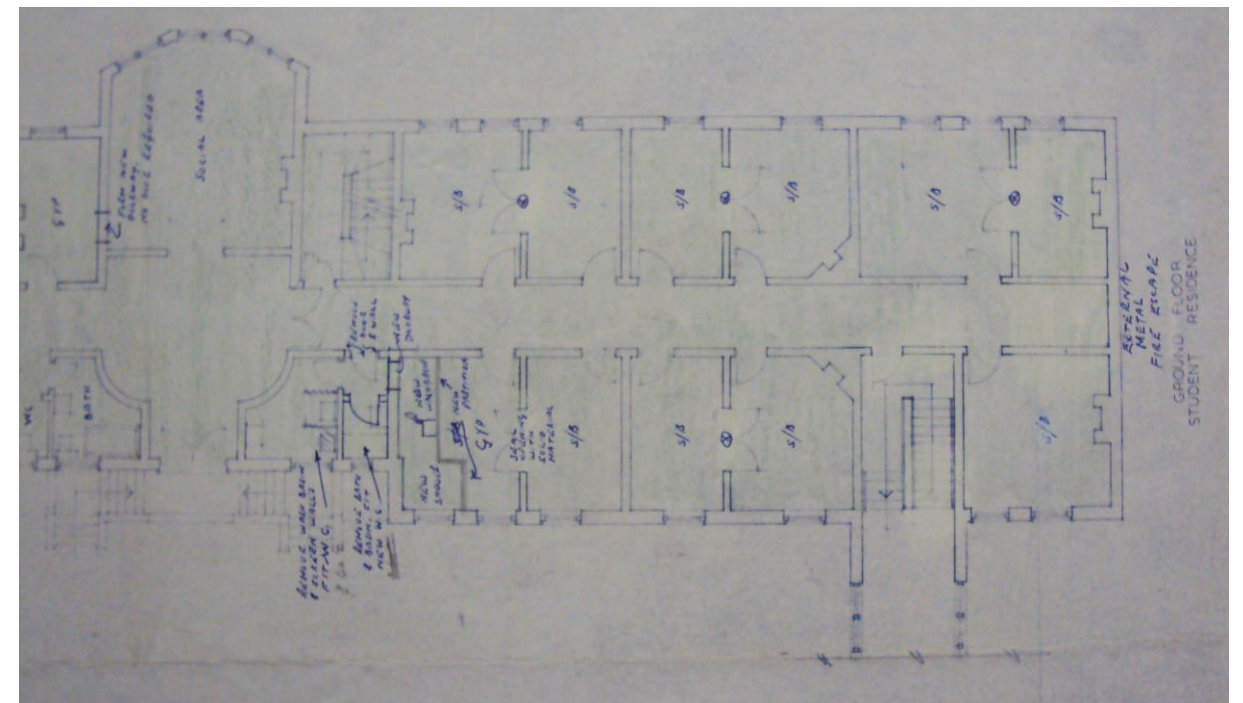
Part of a ground floor plan dating from 1970 showing the layout of the accommodation.
